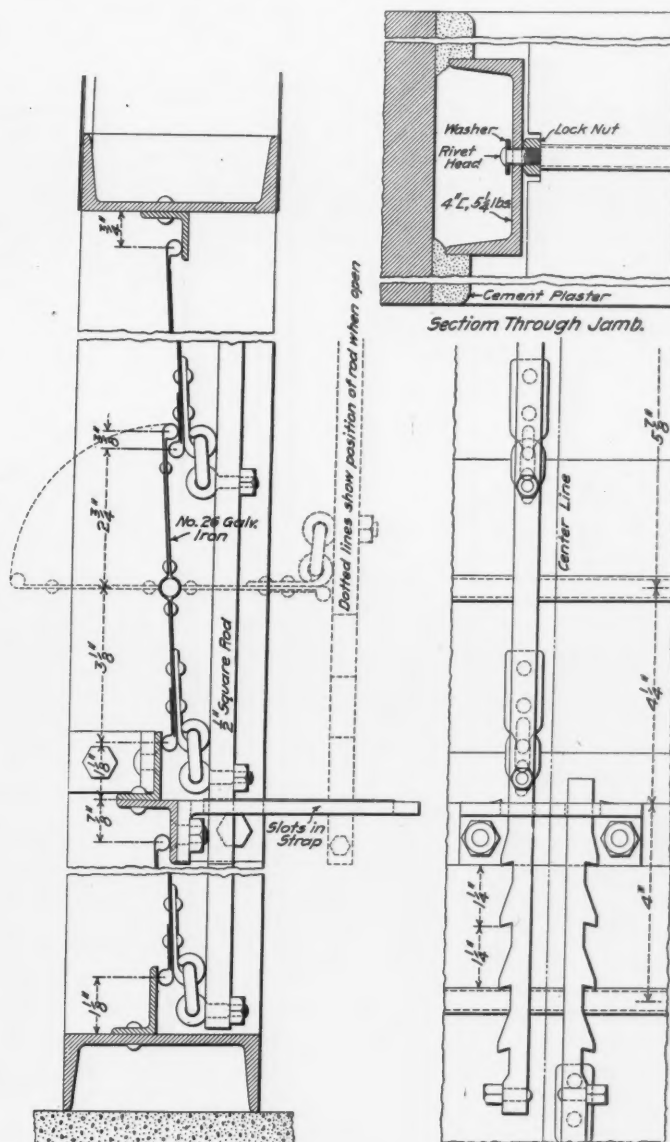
Details of Return Air Shutter in Fan Room Wall.
